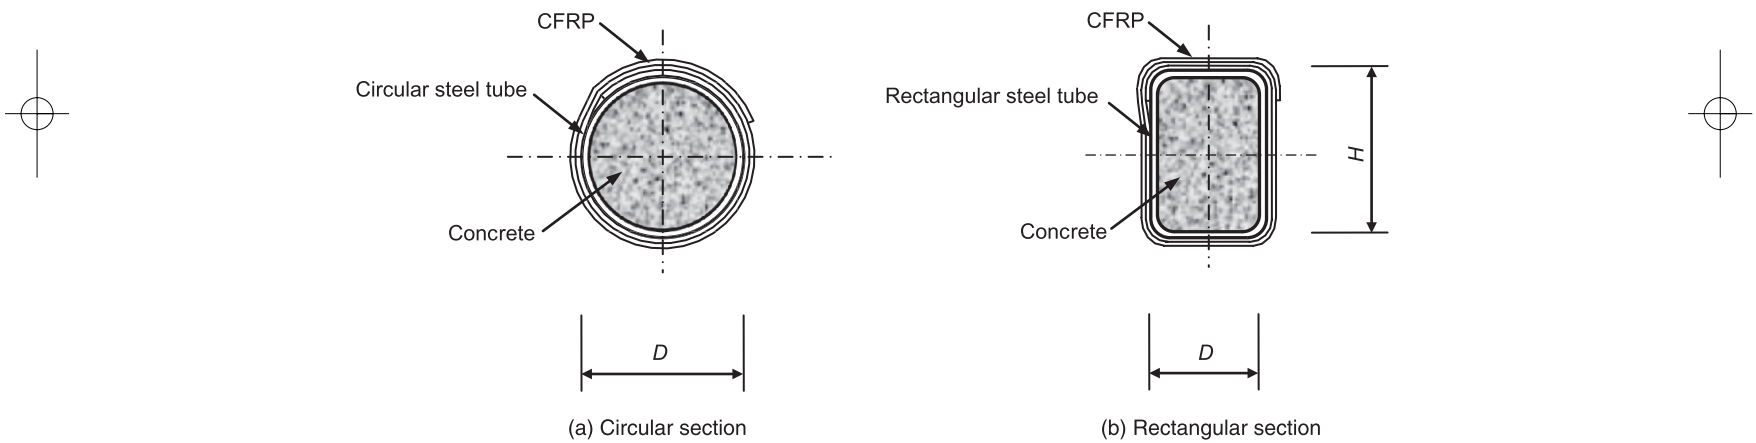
Cross-sections of CFRP strengthened concrete-filled steel tubes
